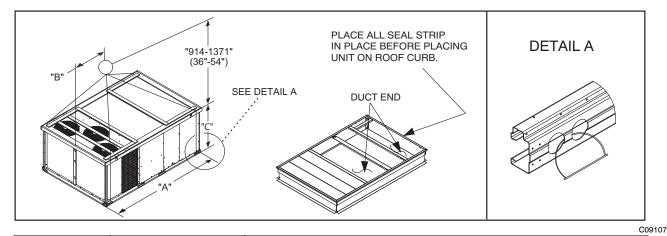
Roof Curb Details - 24 and 26 Size Units
